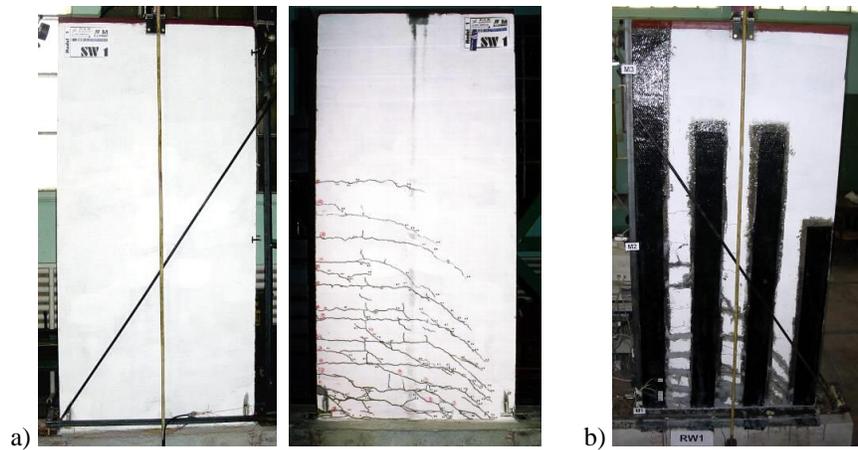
Test models a) before and after testing (SW1); b) after consolidation (RW1)
